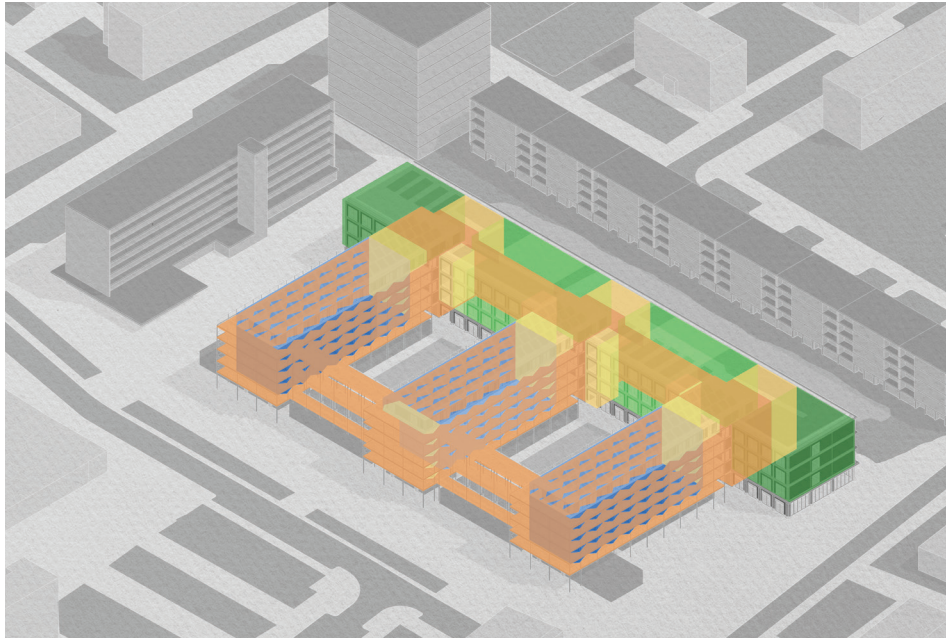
Central circulation system allows residents to walk around the whole building with all dwelling oriented towards this space. For the transformed block the gallery is also an outdoor space.
